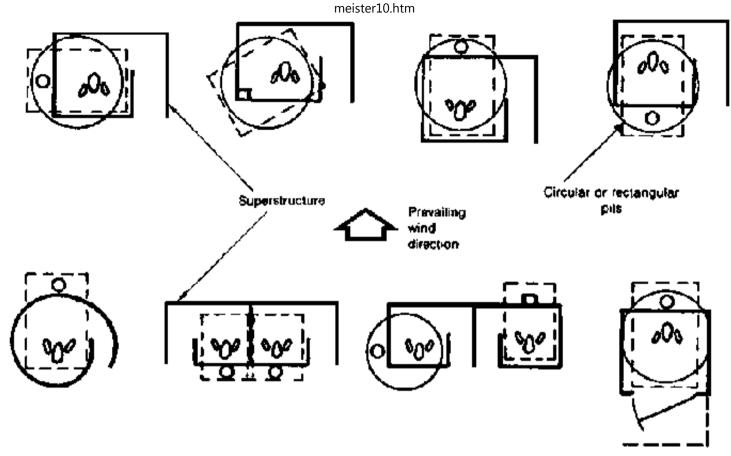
Layouts for superstructures, vent pipes and pits
